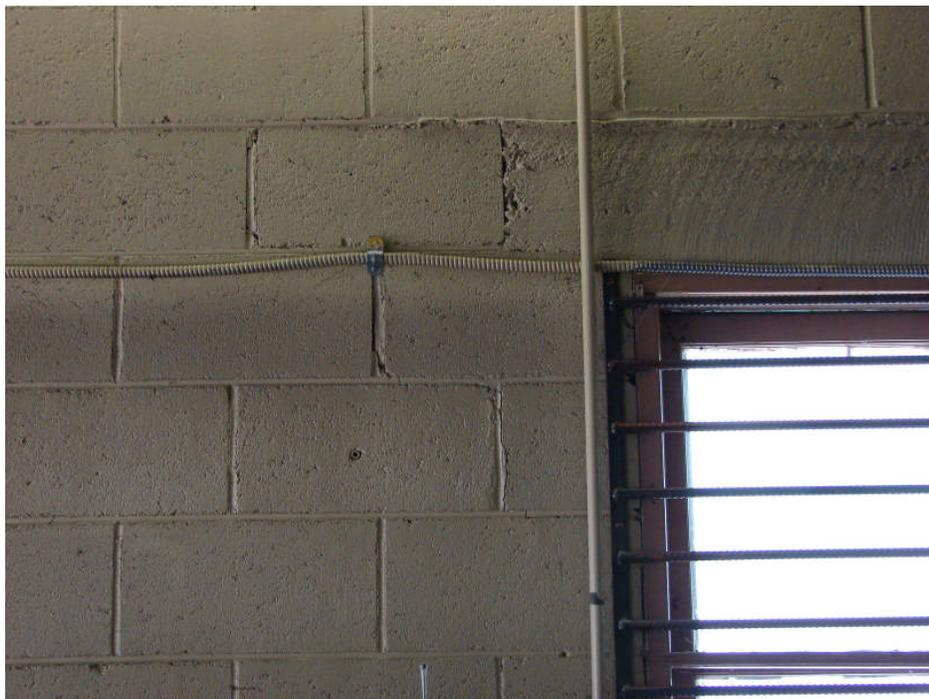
Garage Building east wall – concrete block wall step cracking at south end, typical.
